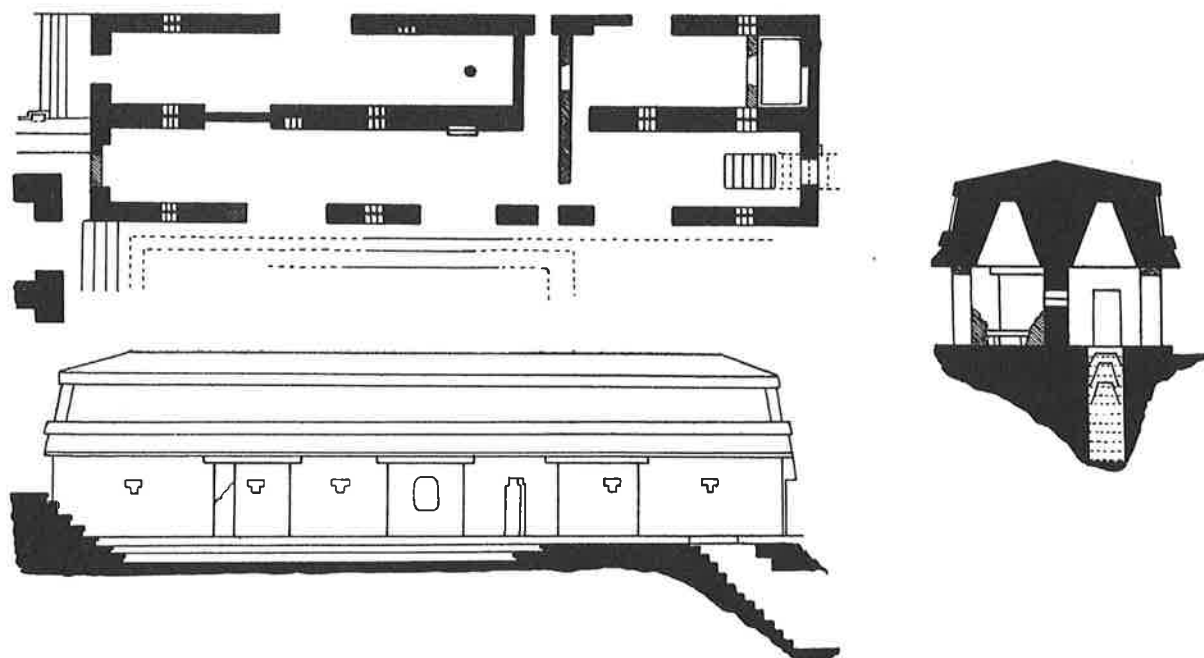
Palenque, Palace, House E, plan, section, elevation (after Seler 1915, figs. 98-100)
